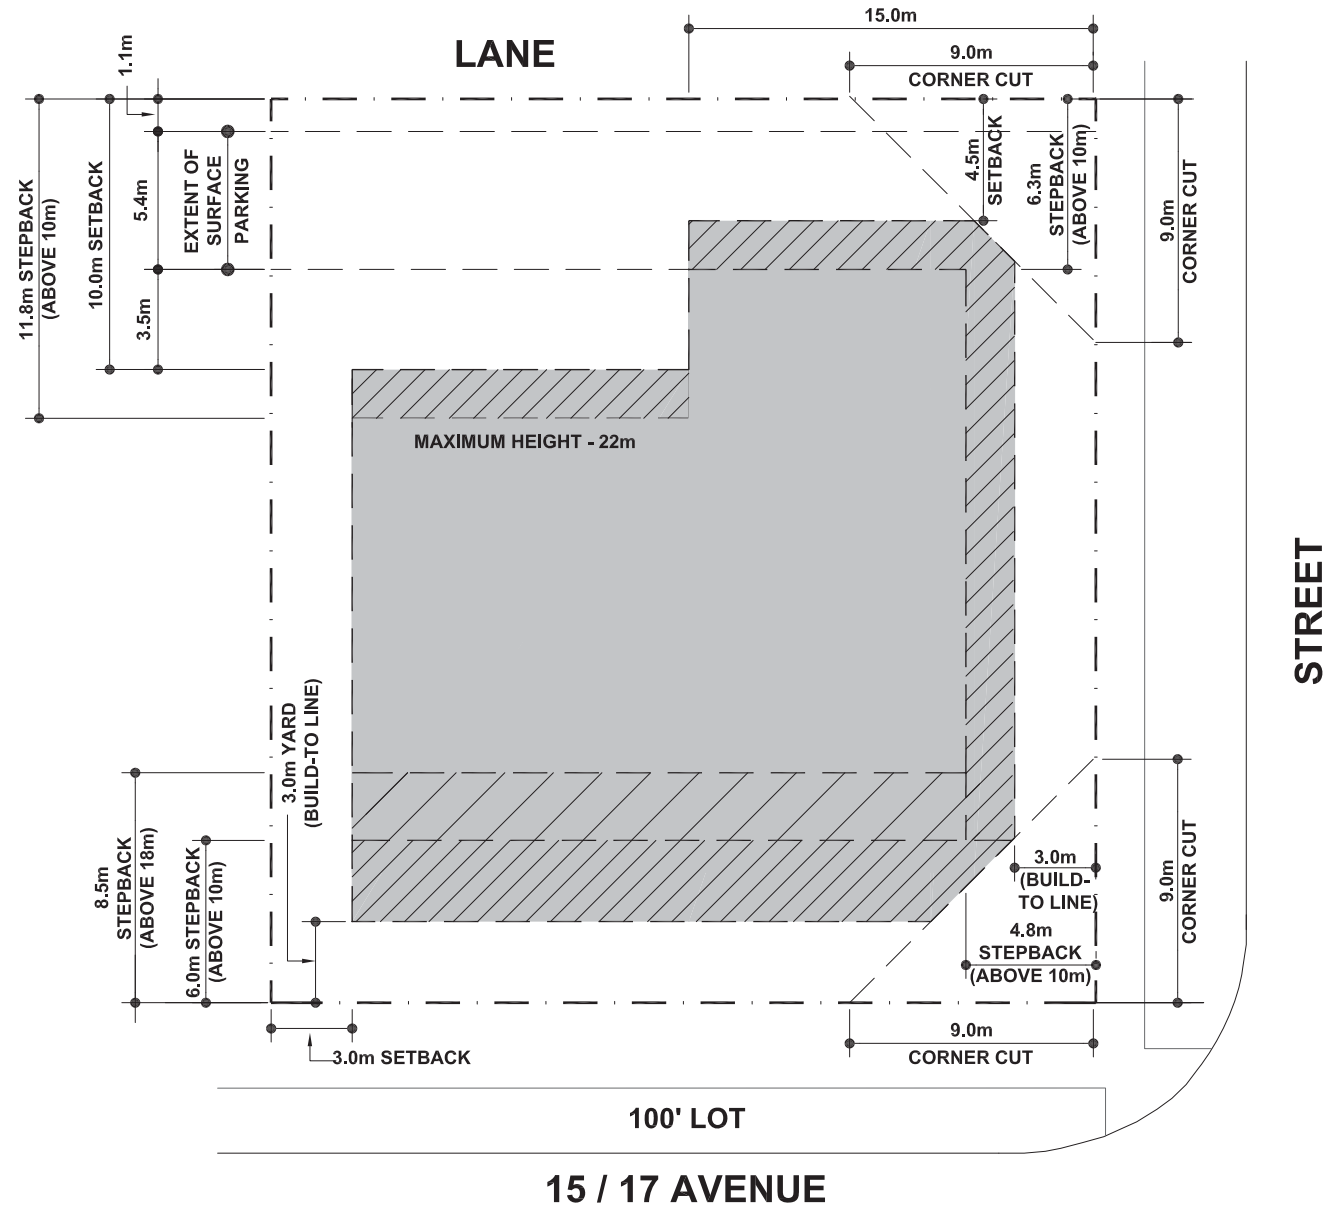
Building Form Example – Multi-residential Support Commercial Use Areas at Corner
